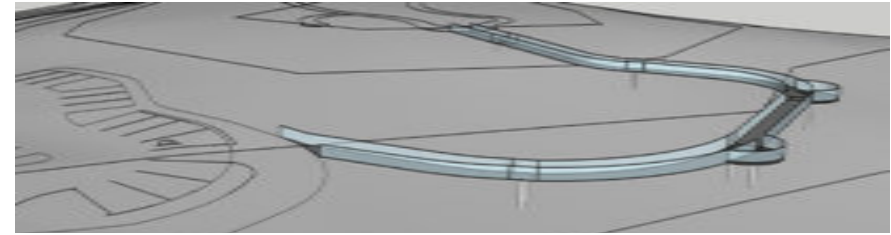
The Sculpture Hill - Alternative accessible link boardwalk platform concept - Plan
